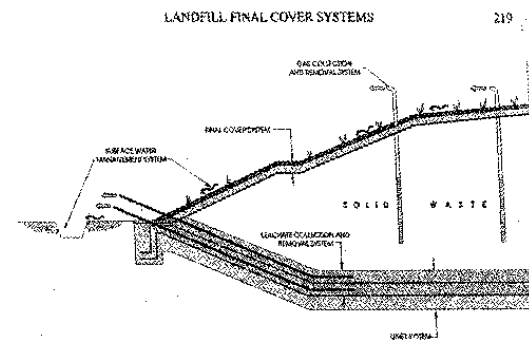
General layout of engineered systems used for liquid and gas containment/collection at MSW landfills.
